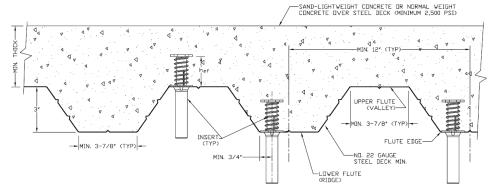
A—BANG-IT+ INSERTS INSTALLED IN SOFFIT OF CONCRETE-FILLED STEEL DECK FLOOR AND ROOF ASSEMBLIES<sup>1,2,3,4</sup>
